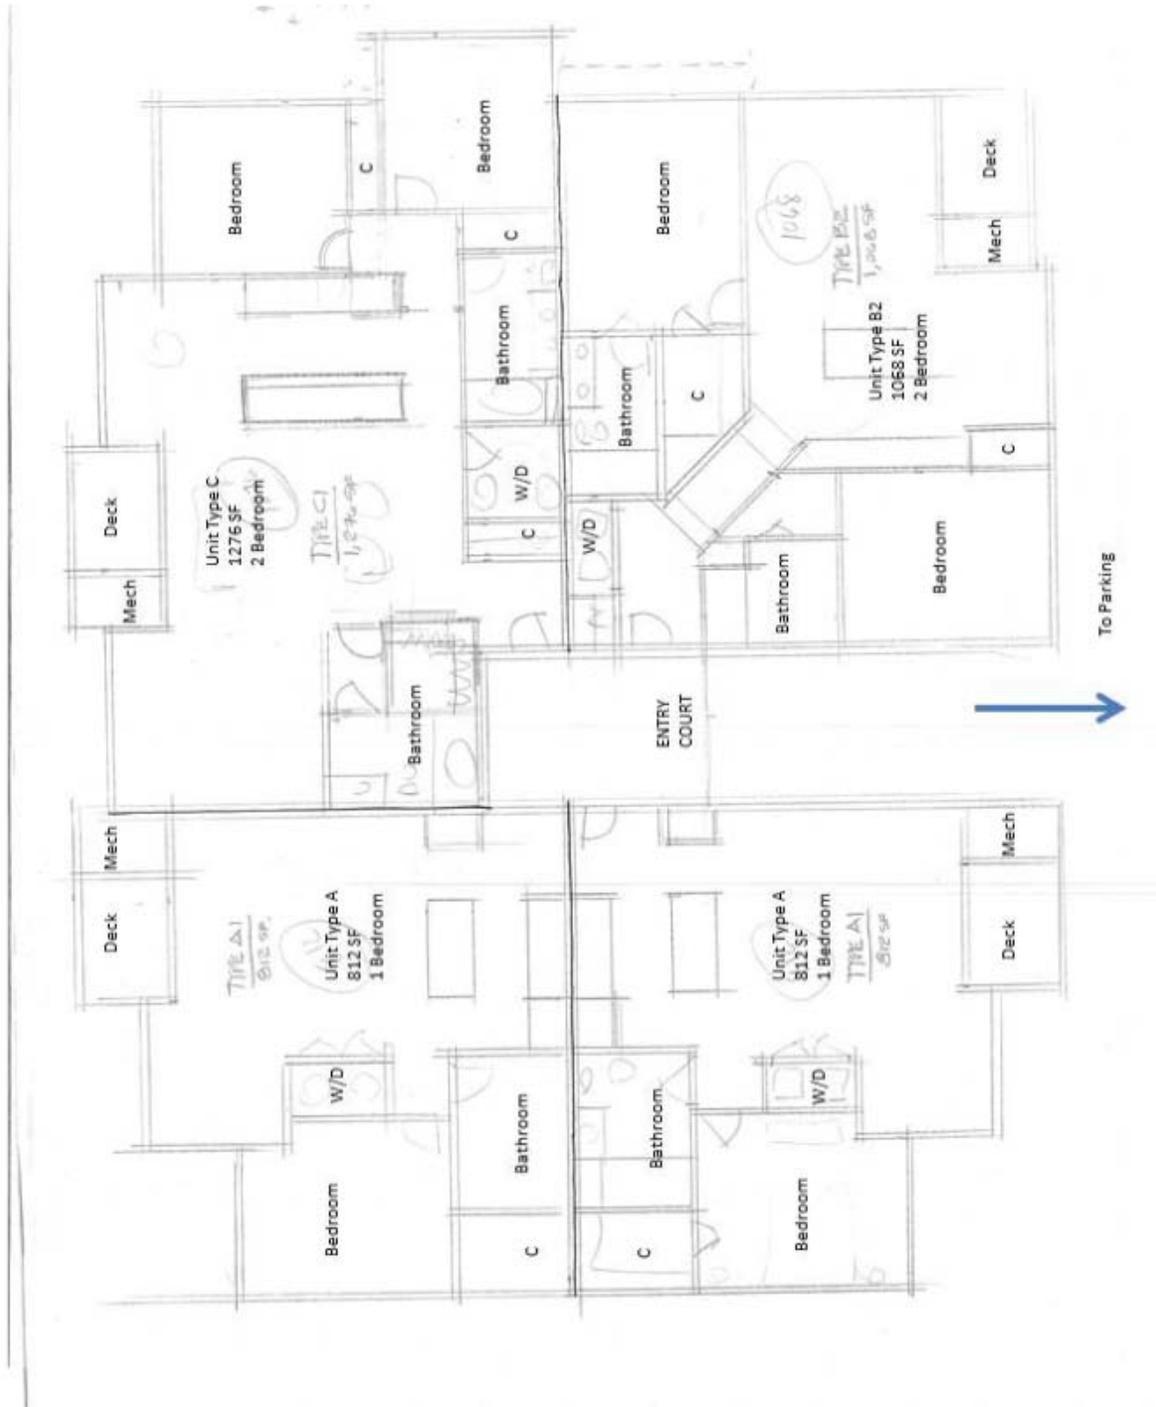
TYPICAL FLOOR PLAN – MODULE A
